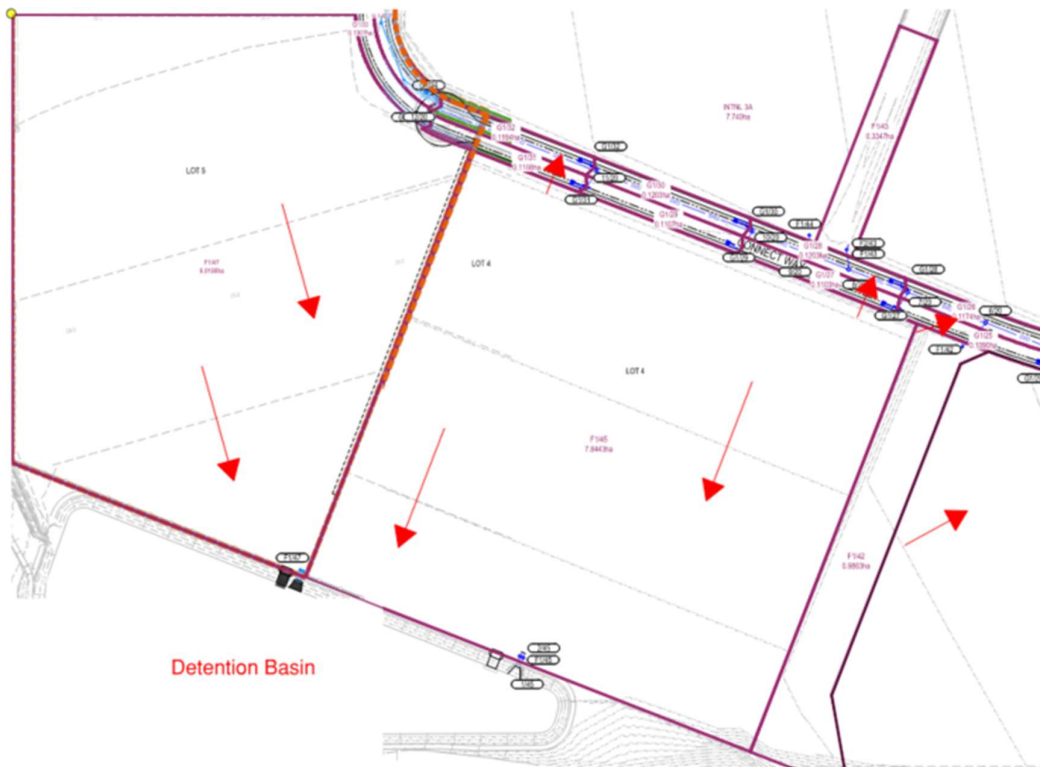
Stormwater Outlet into the Stage 2 Detention Basin (Extract from Stage 2 Engineering Drawings by Arcadis)
